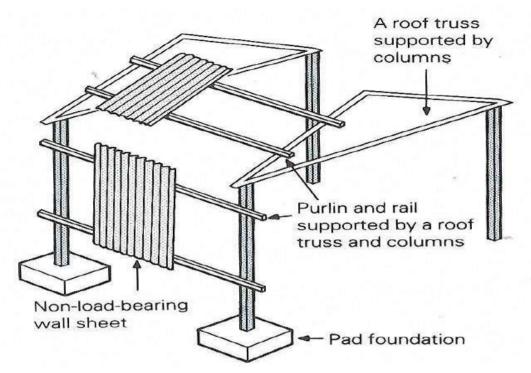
Non-load-bearing external walls Internal walls should have the following characteristics:
